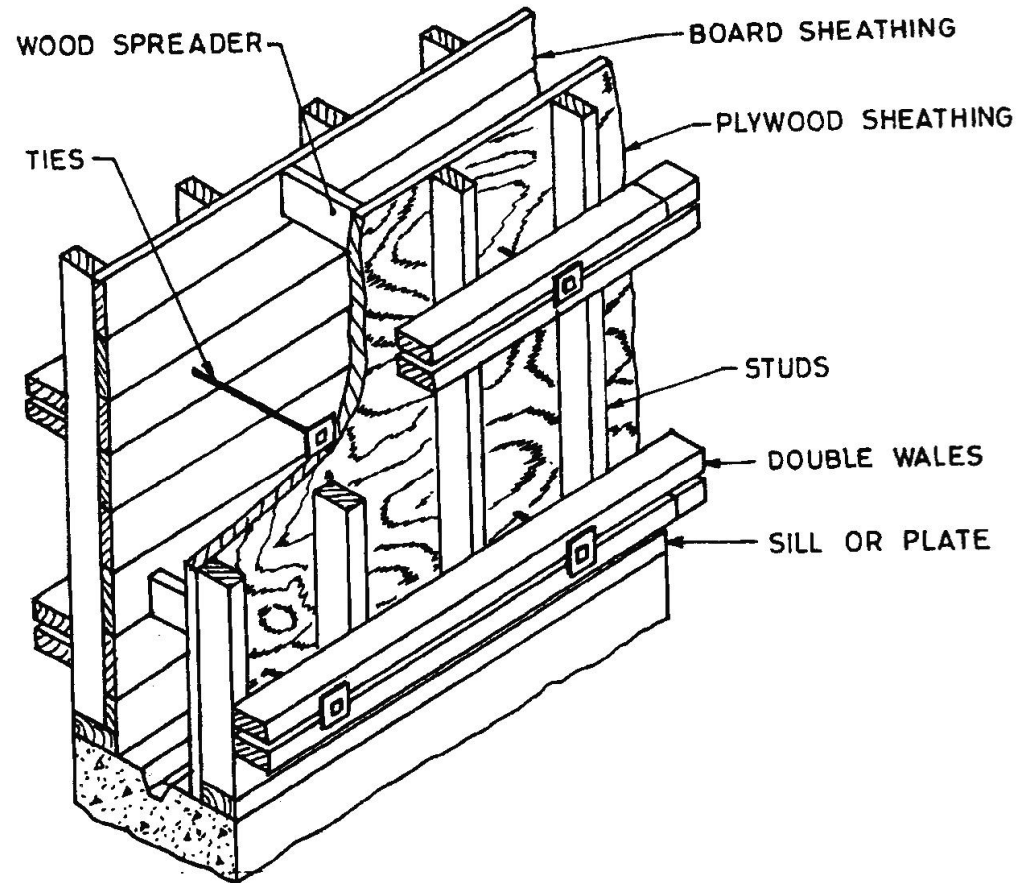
TYPICAL WALL FORM SHOWING WALL TIES
